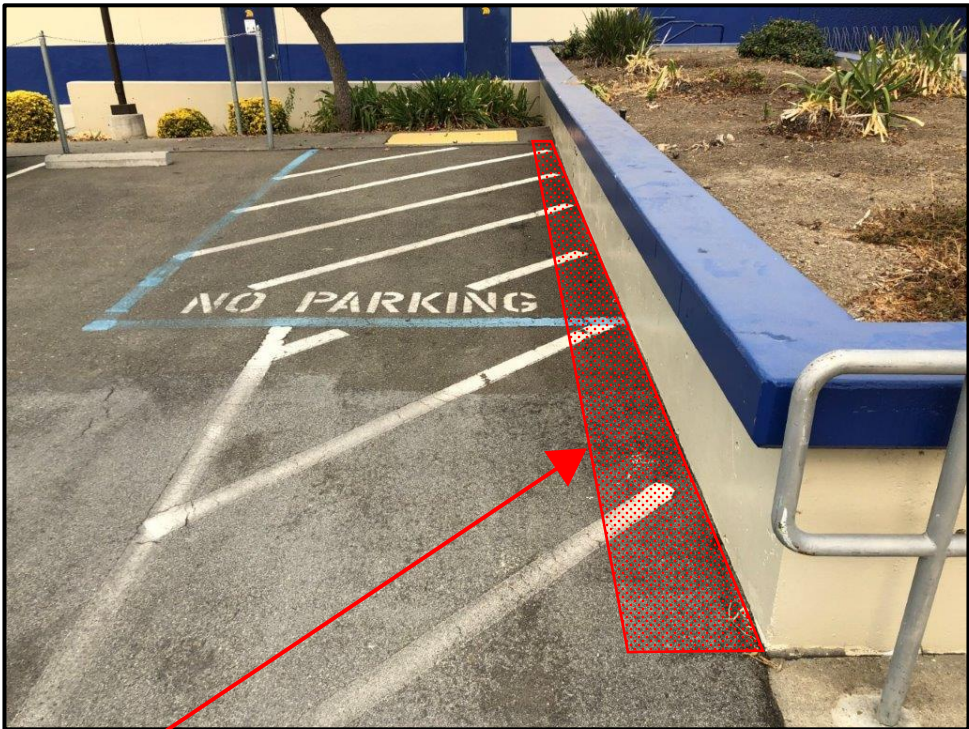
Black out with approved traffic marking paint from planter corner to end of asphalt paving 6" past top edge of seat wall. Do not paint over "NO PARKING" sign. Do not paint vertical planter wall.
